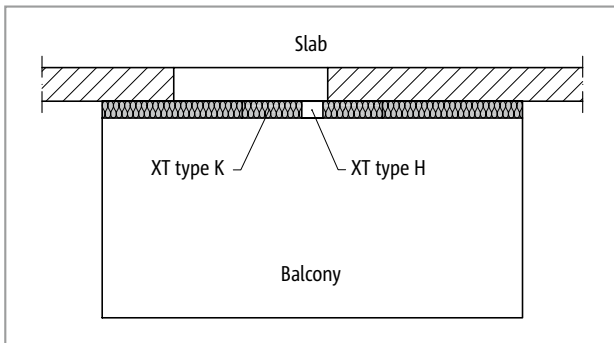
Schöck Isokorb® XT type K: Balcony freely cantilevered; optional with XT type H (from page 125) with planned horizontal loads (e. g. closed ballustrades)
